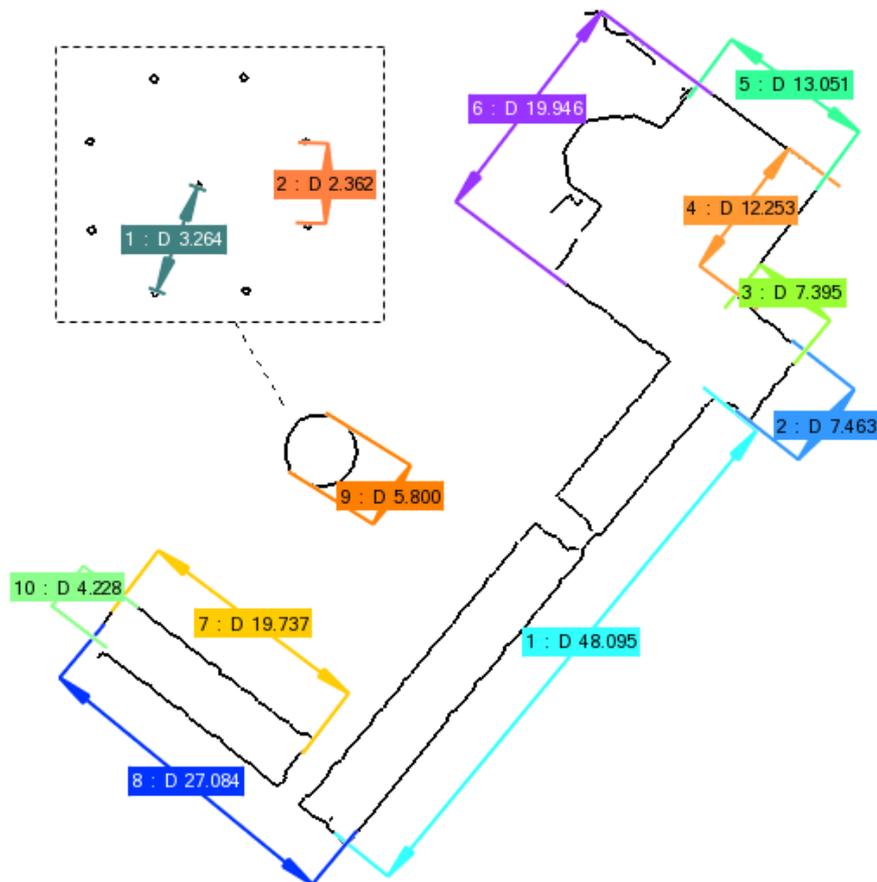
Ground plan that was created from cross-section of reference plane and point cloud and dimensions of the structures (units are meters).
